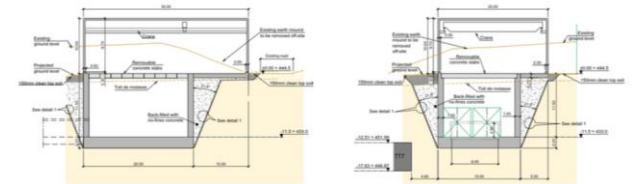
Typical Sections through the experimental hall parallel to the beam-line (left) and transverse to the beam-line (right)
